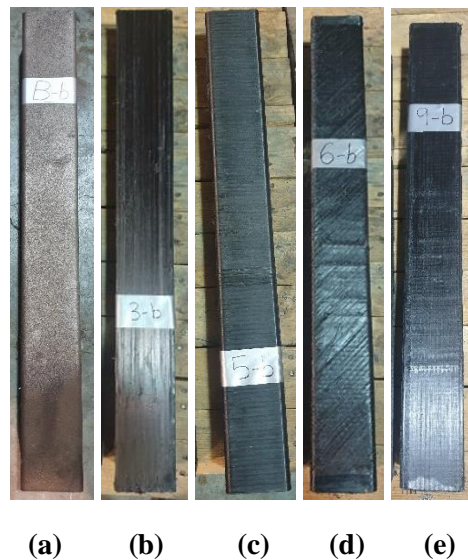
SHS beam: (a) Control beam; (b) Longitudinal reinforced specimen; (c) Transverse reinforced specimen; (d) Reinforced specimens with additional layer of 45° and (e) Transverse and longitudinal reinforced specimens
